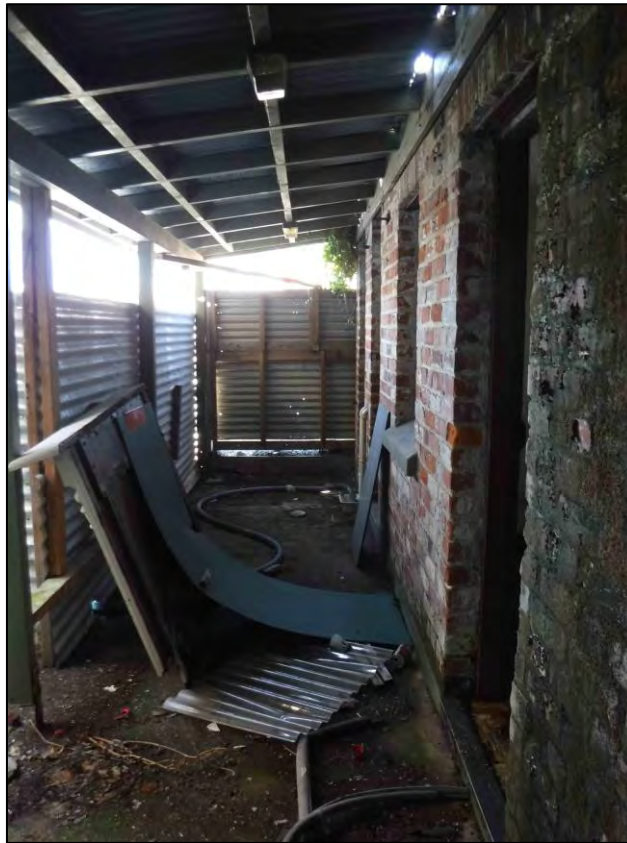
Left: east elevation of the toilet block (photo facing south).
